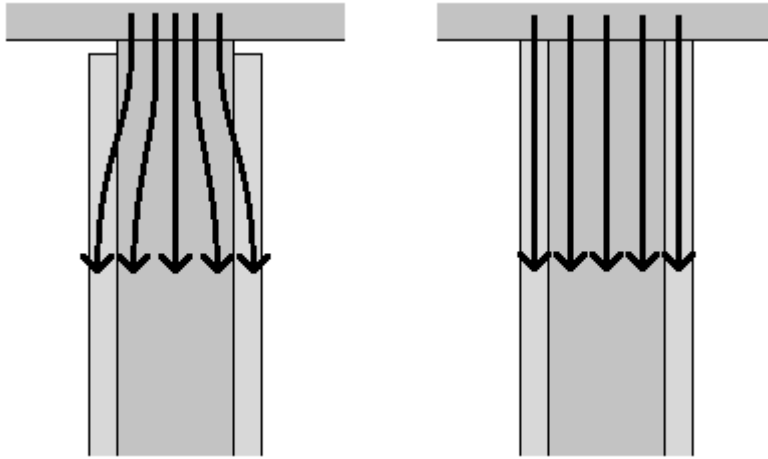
Strengthening of columns with section enlargement that is a) loaded through the original column and b) loaded directly from above.
